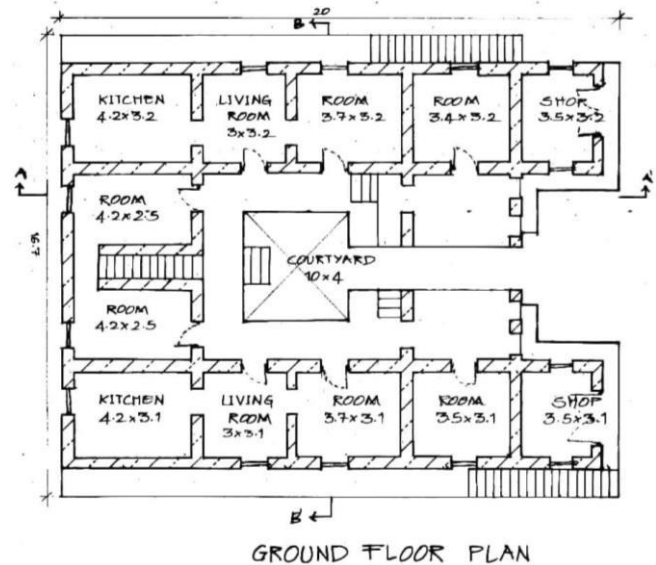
case 2 – Nagamma House ground floor plan (Source: Author)
